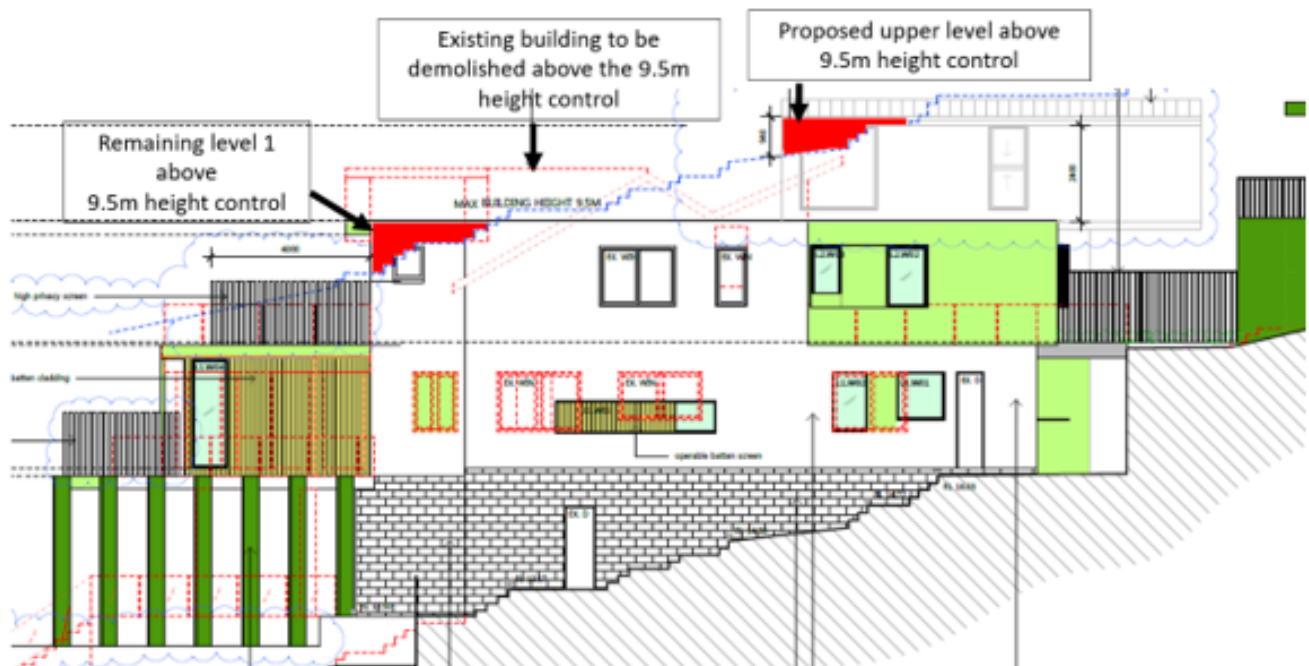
East elevation. Existing and proposed built elements varying the height standard.
